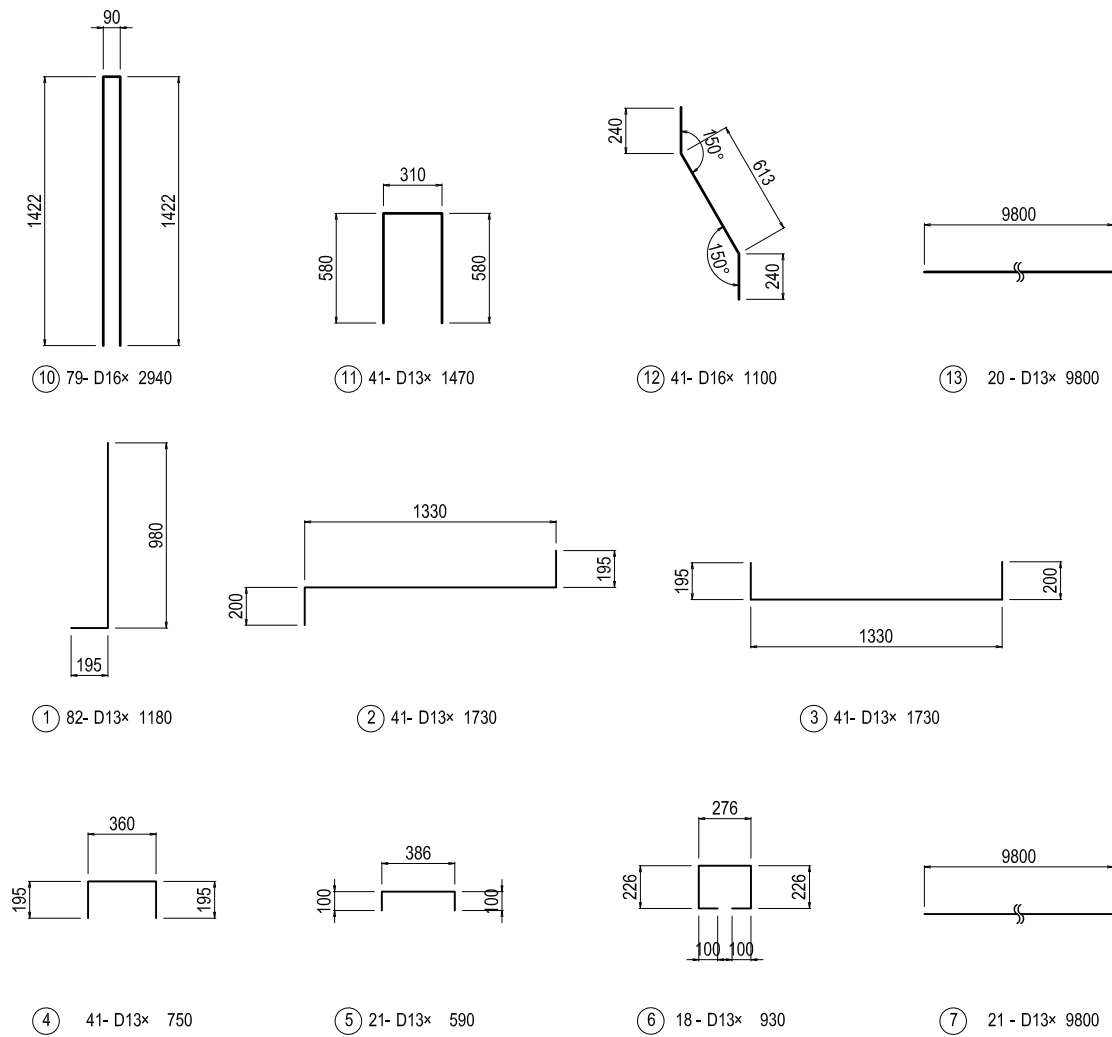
DETAIL OF MECHANICALLY STABILISED EARTH WALL(4)
